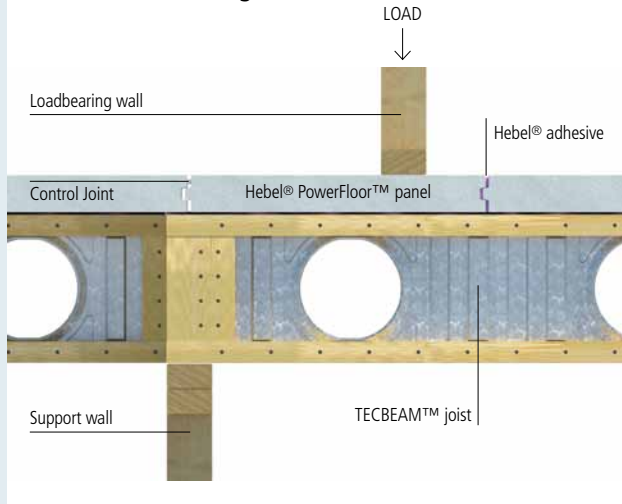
Recommended Control Joint Location for change in TECBEAM™ joist orientation
